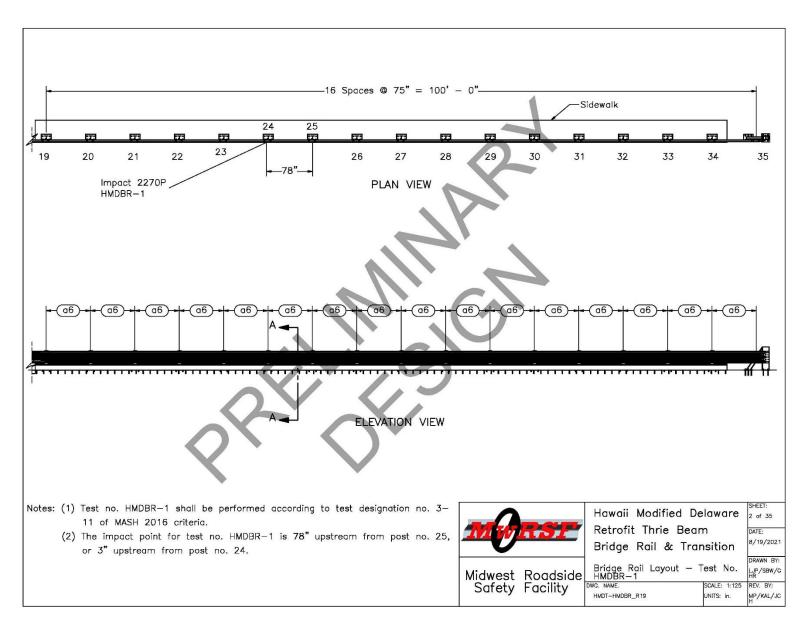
Bridge Rail Layout, Test No. HMDT-1
